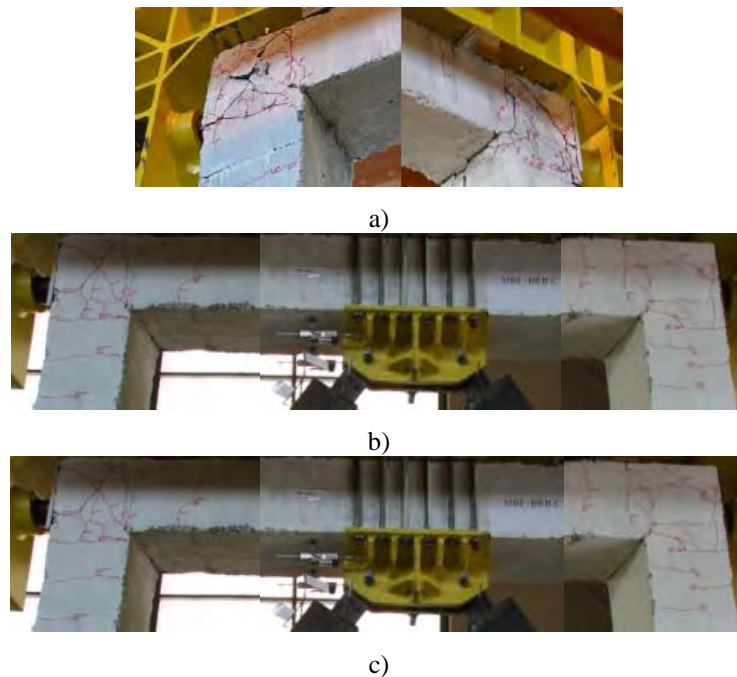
Cracks in the concrete elements after the test: a) initial RC frame; b) frame strengthened with BRB; c) strengthened with CBS
